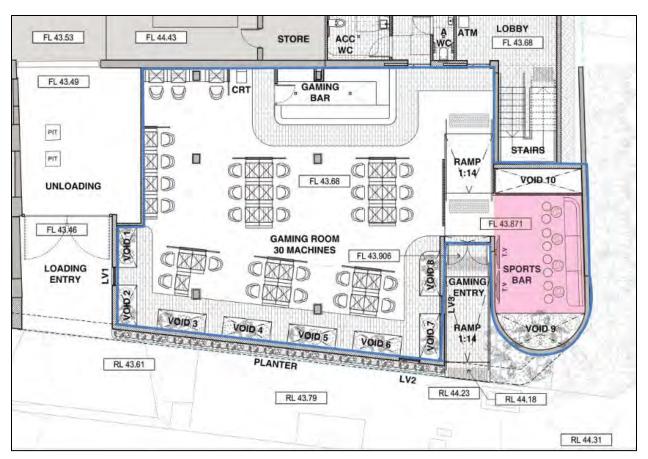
Areas with additional capacity restrictions (Source: Design Collaborative/Paul Kelly Design)
